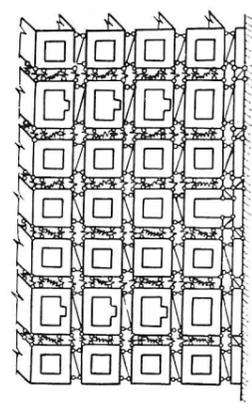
Design diagram of an outer wall of a large-panelled building at bending in plane.
